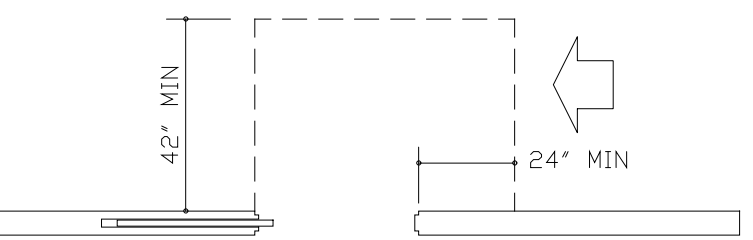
LATCH SIDE APPROACH-SLIDING/FOLDING DOORS
